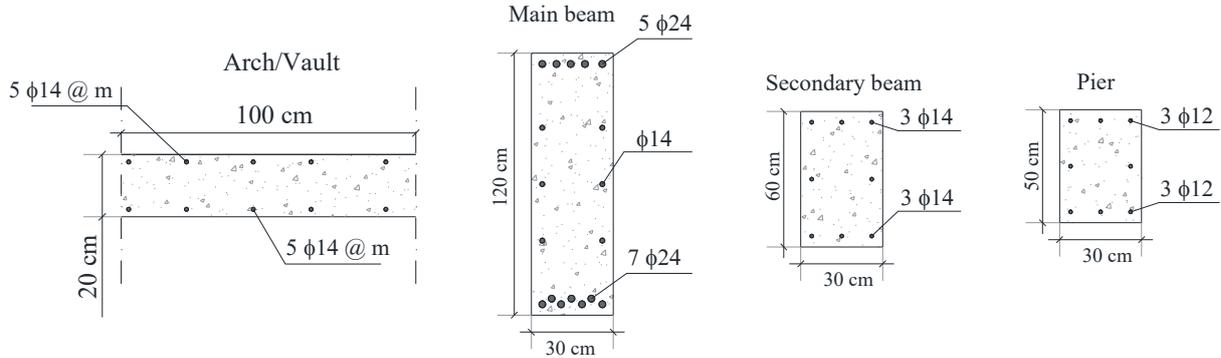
Details of cross section and steel reinforcement of different structural elements.
